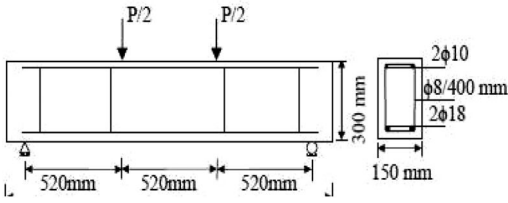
Geometry, arrangement of reinforcement and load for beam tested by [1].
